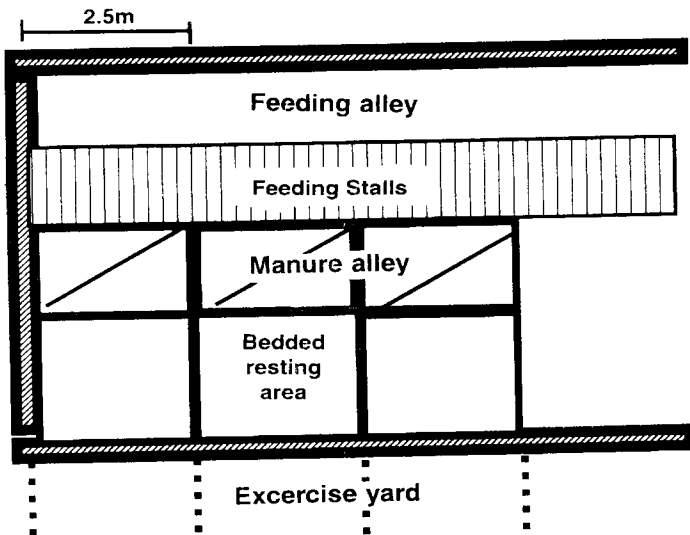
Housing Plan for Gestating Sows
